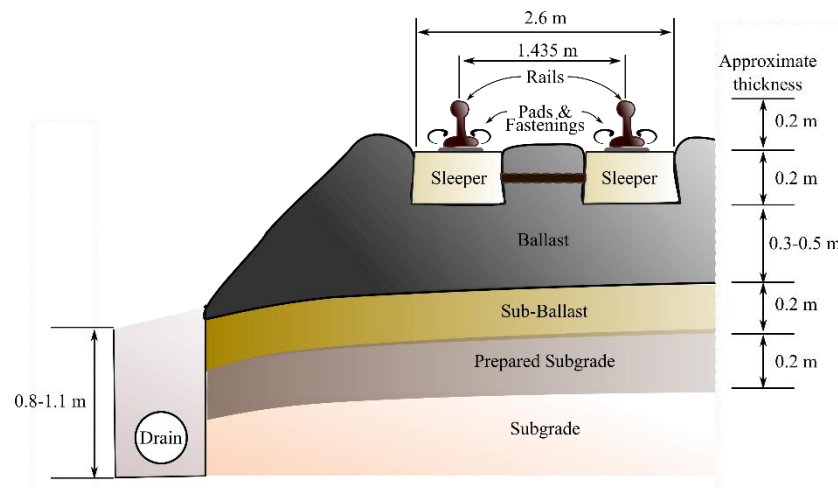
Sketch of typical ballasted trackform for a ballasted high-speed railway, such as HS1.
